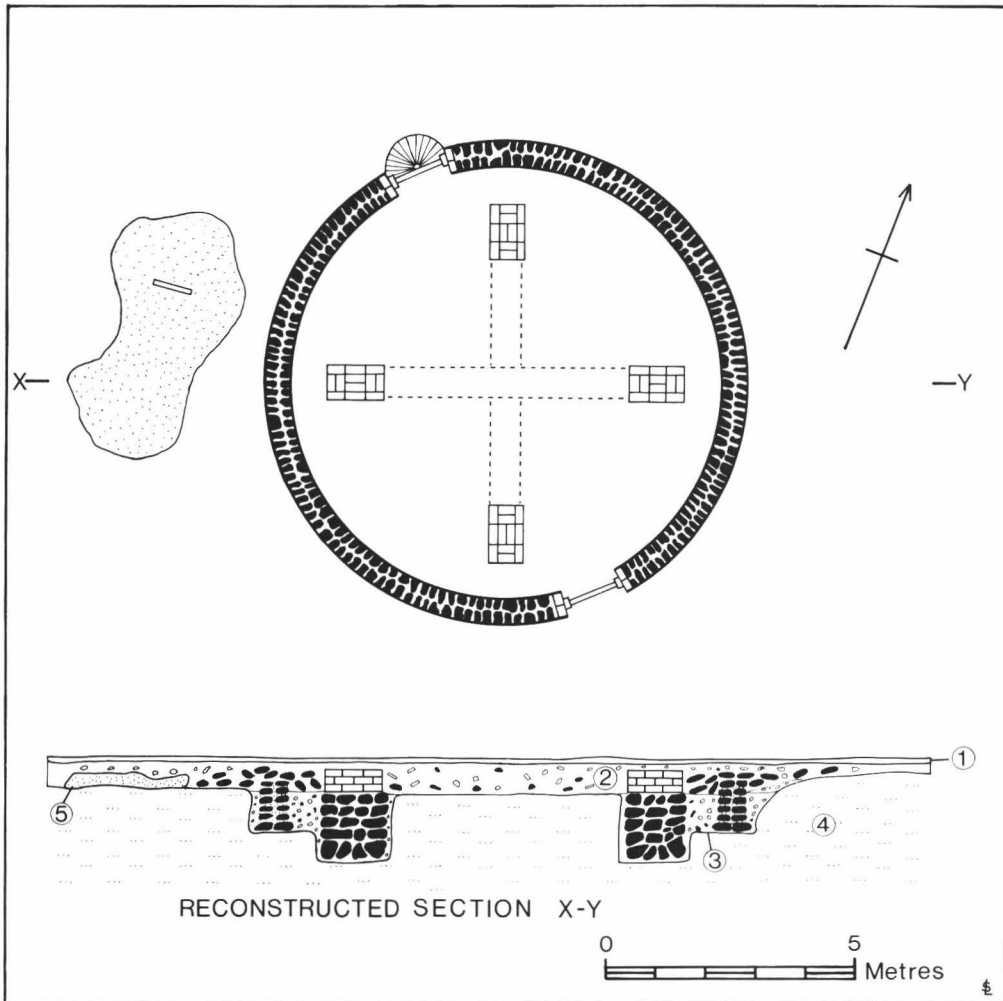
Plan and section of Friston windmill (site 3). The plan shows the flint roundhouse wall enclosing four brick piers that would have supported the cross-trees (dotted). Section layers: 1. Turf and topsoil, 2. Demolition layer, 3. Construction trench, 4. Clay with flints, 5. Mortar spread.
